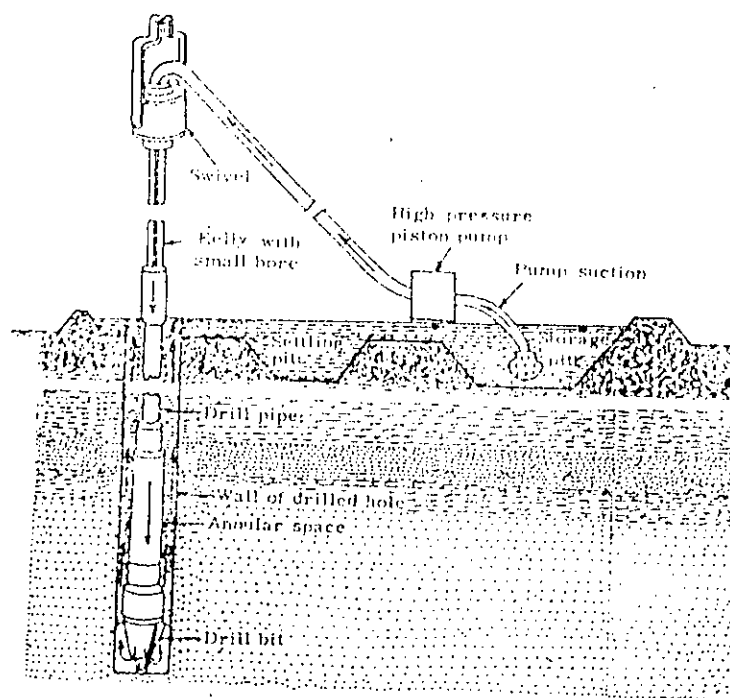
11 Schematic sketch illustrating the basic principles of direct rotary drilling.
